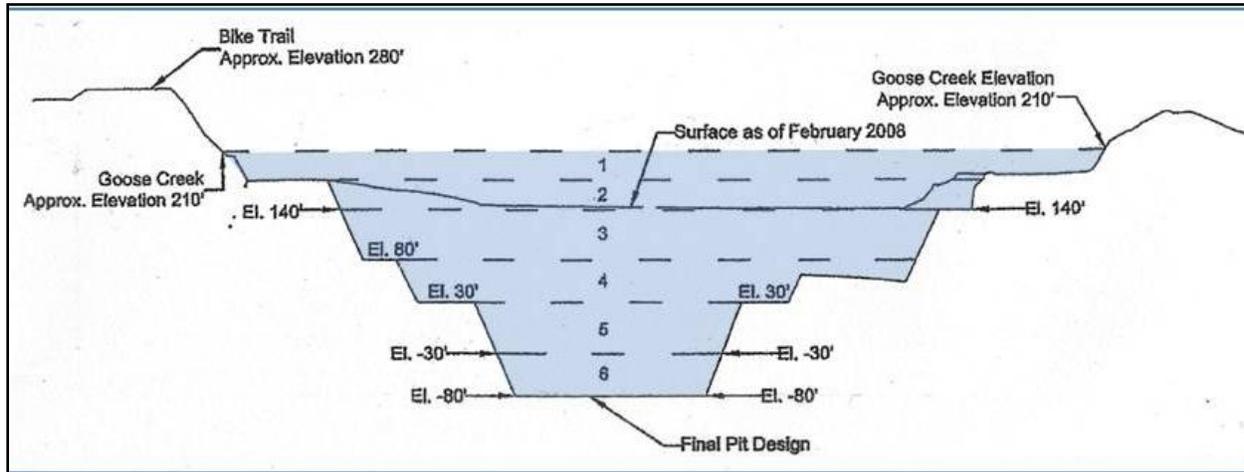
Design of Water Storage Facility – Maximum Surface Water Elevation
